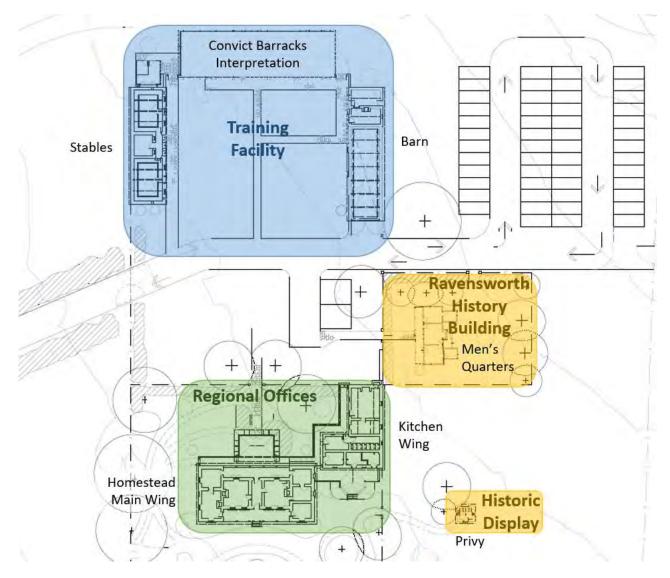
Ravensworth Farm Conceptual Use Plan
